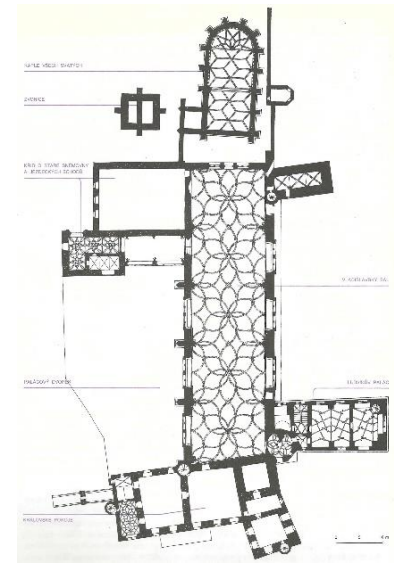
Floor plan of the royal palace after reconstructions carried out under Vladislav II. [3], page 83
